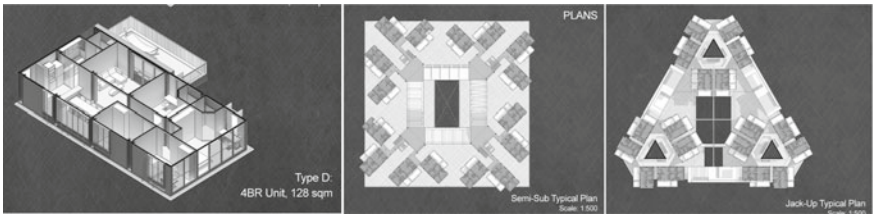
Layout of 4-bedroom housing units on a semi-submersible and jack-up rigs
